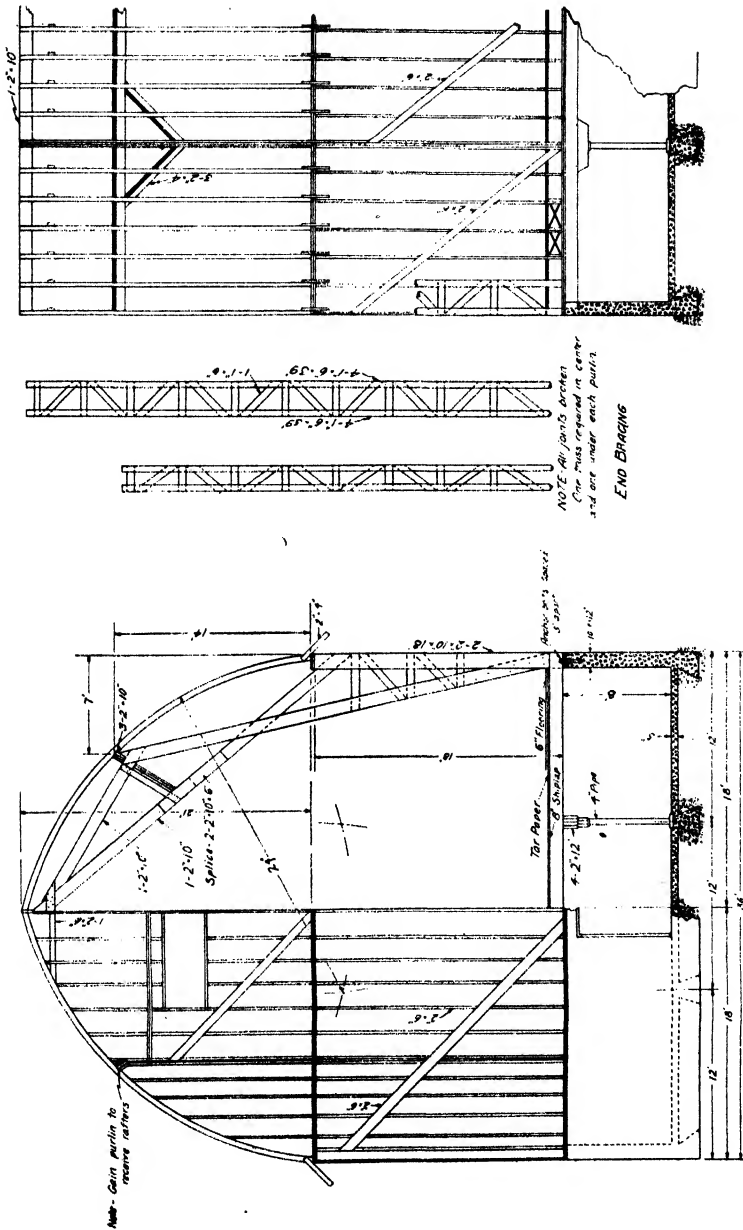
Framing details of a Gothic roof on a Shawver Truss.
